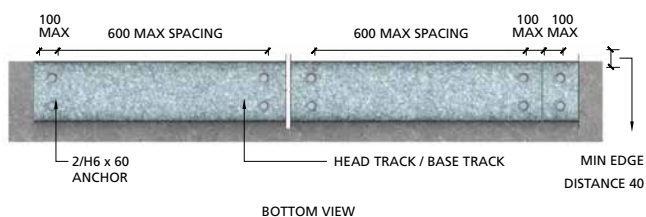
(A)B1: TRACK FIXING TO CONCRETE SUBSTRATE (TRACK WIDTH 150MM)
